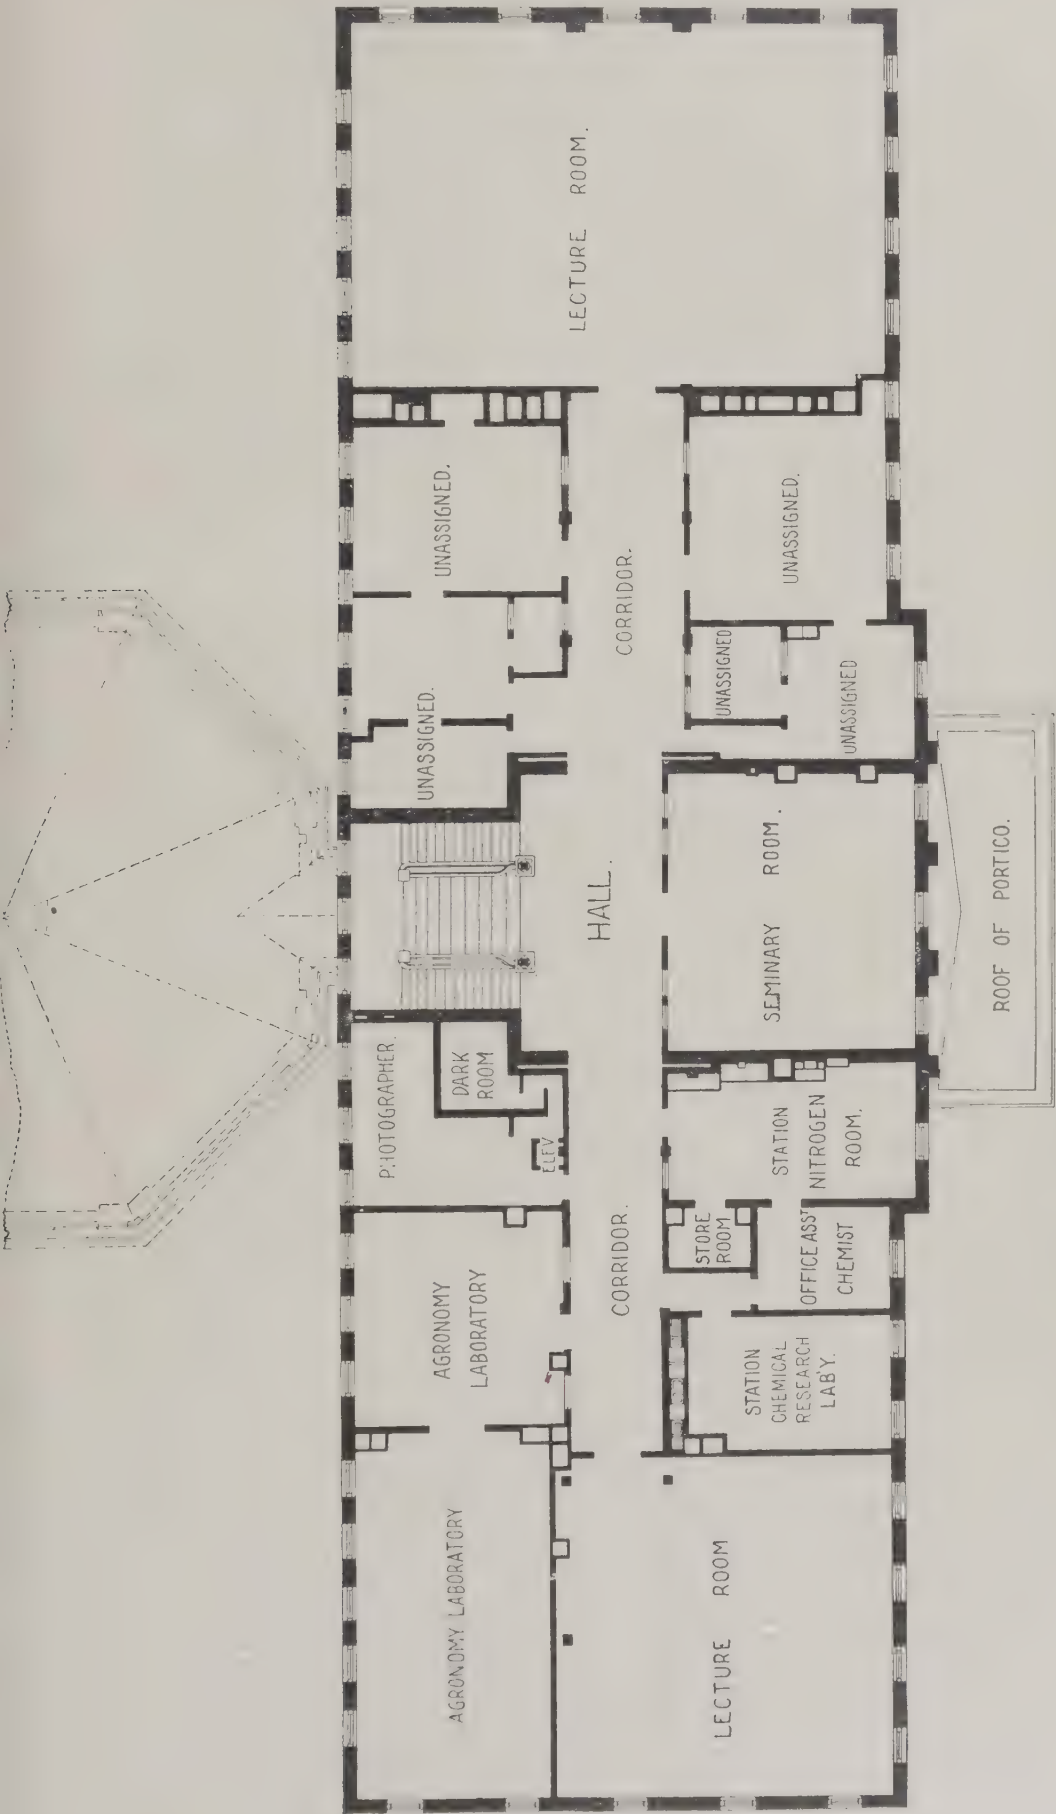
Third-floor plan, Agricultural Building, Wisconsin University.
